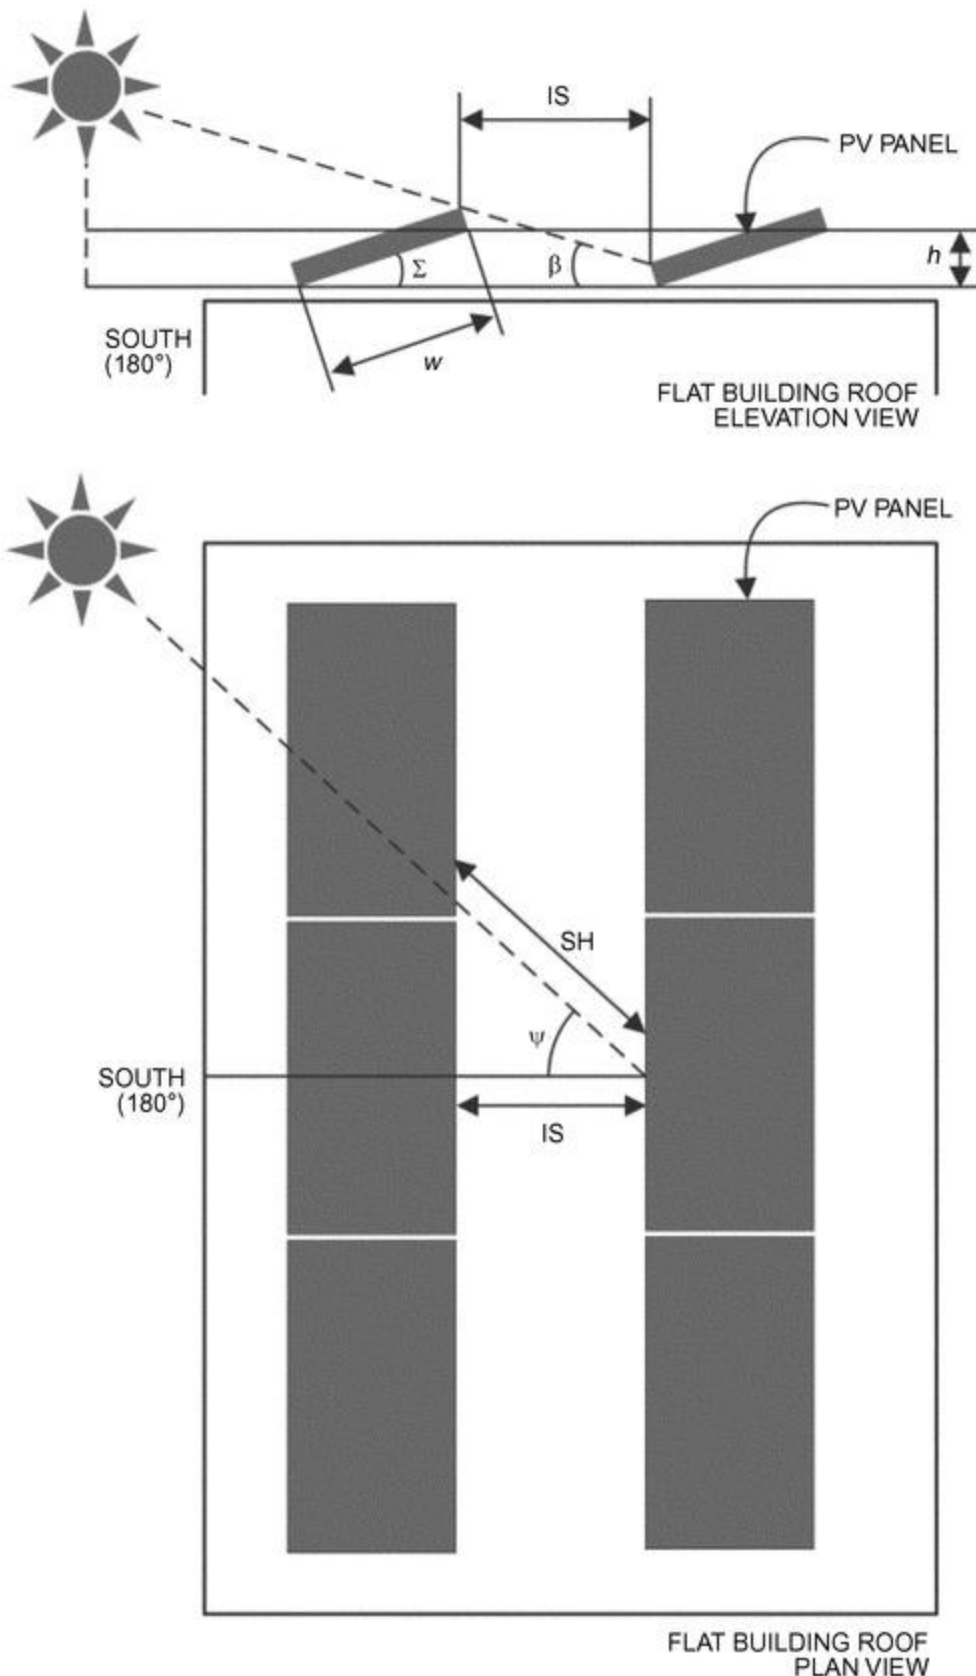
Side View and Top View of Tilted PV Array Mounted on Flat Building Roof
